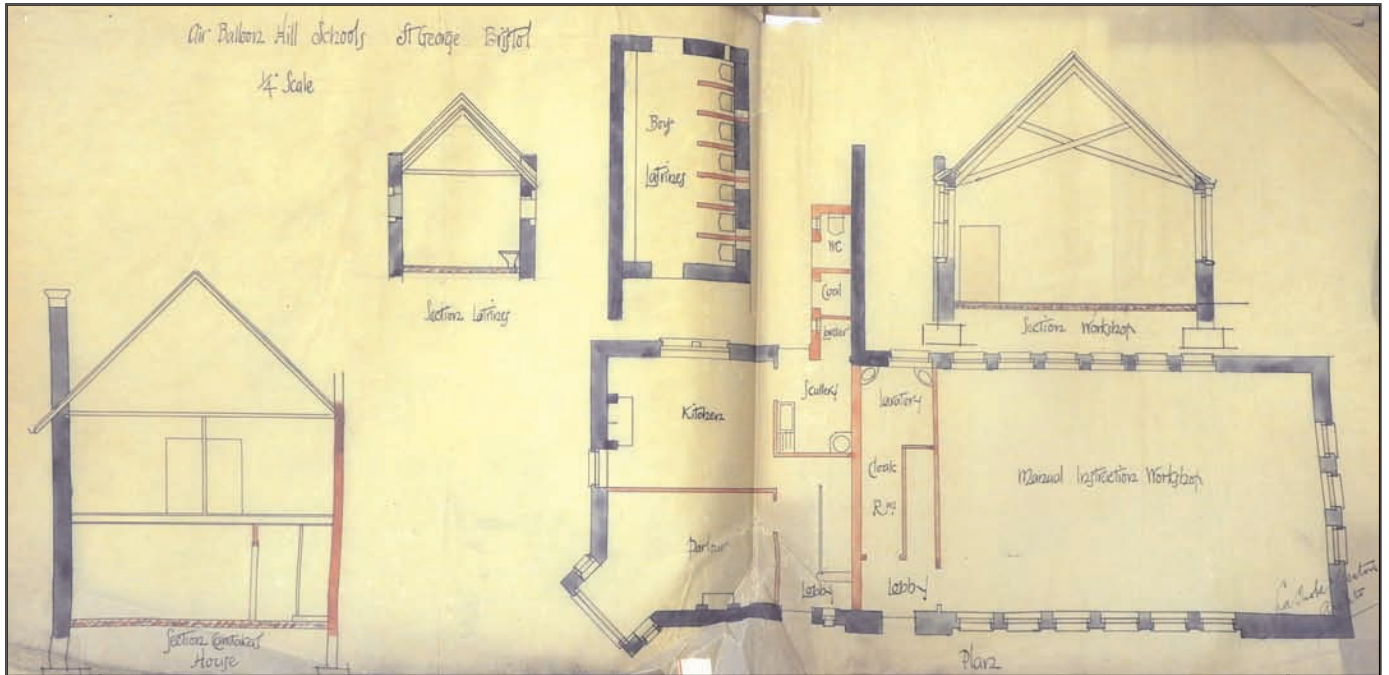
Architects' drawings dated 1903 including sections and footings of school buildings
